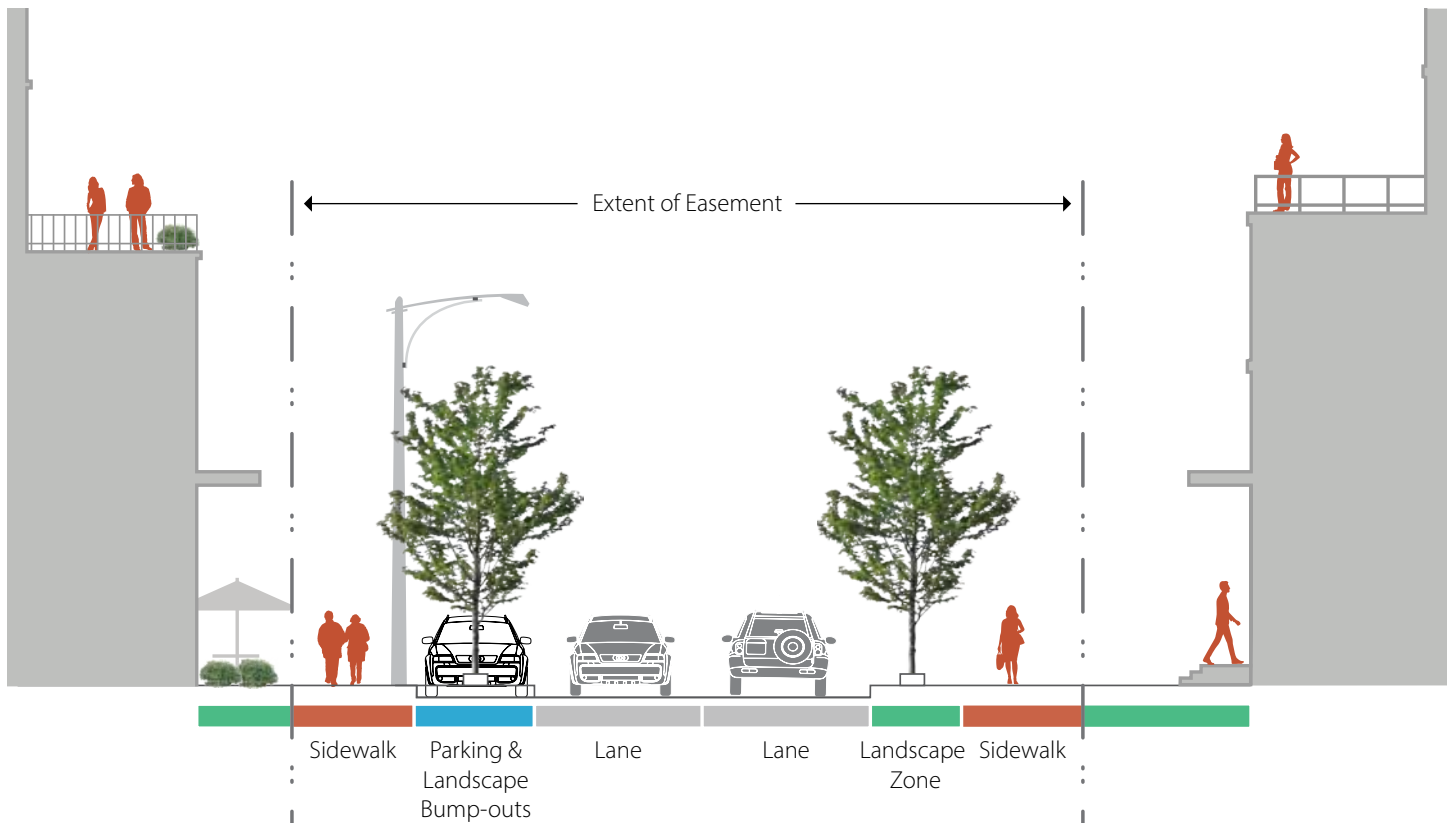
Typical Cross-section of a Private Street with a variety of standard and additional elements shown.
